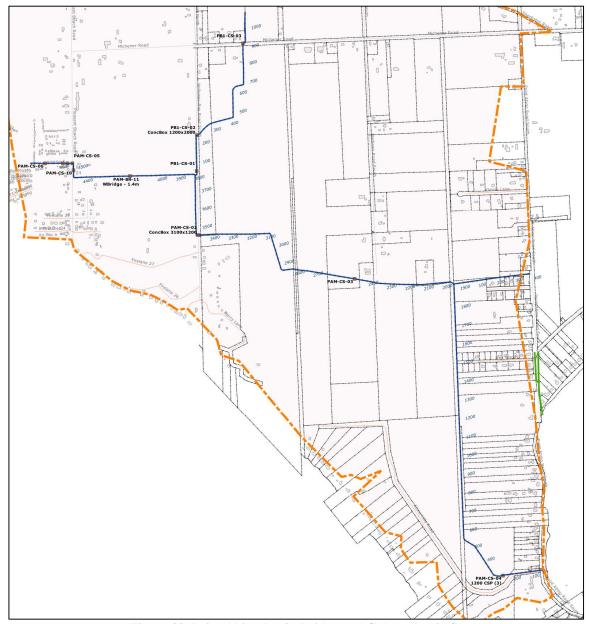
Point Abino Drain Bridge and Culvert Drain Structures
